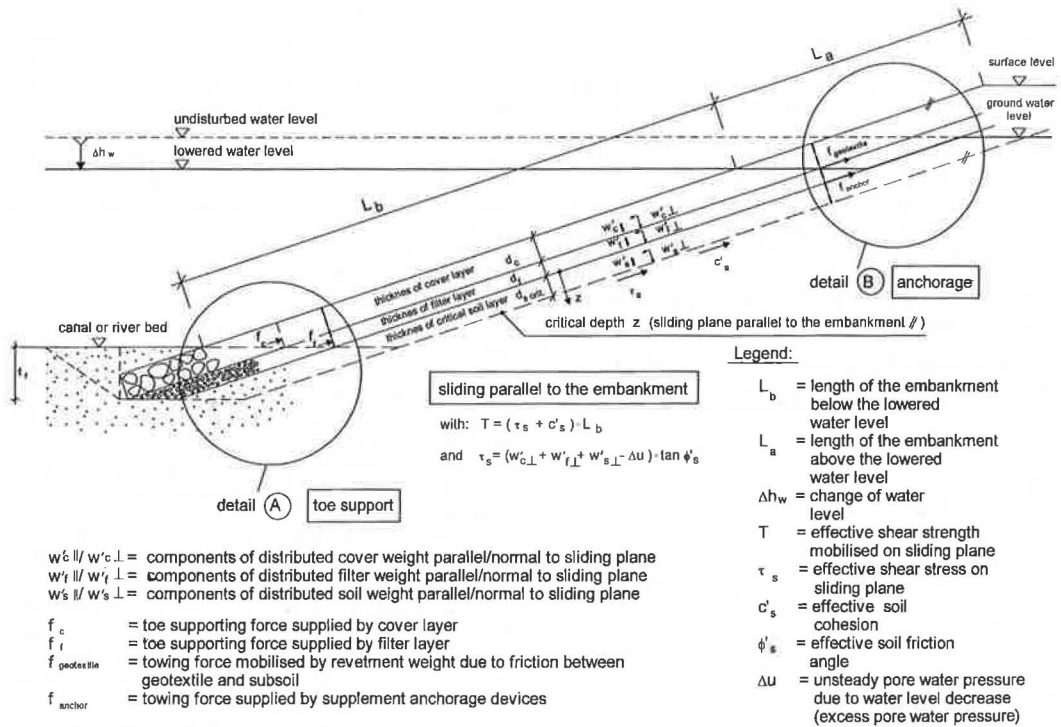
Forces along sliding plane parallel to slope, rip-rap revetment.
